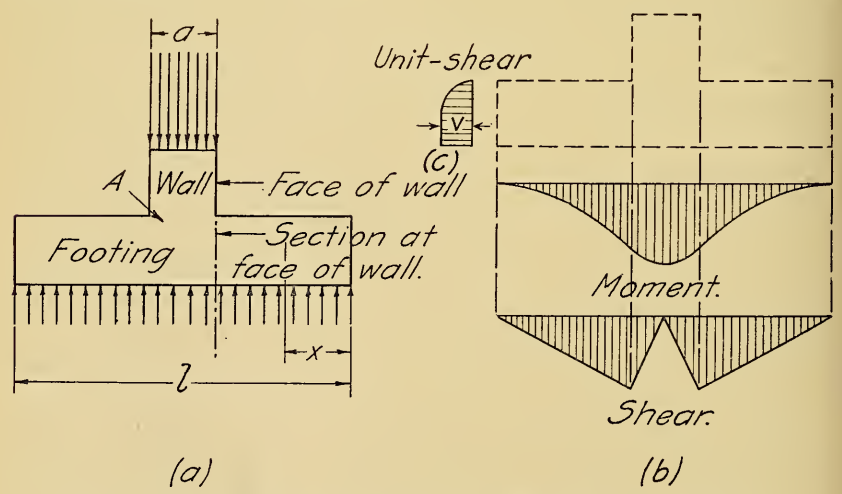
(a) DISTRIBUTION OF LOAD AND PRESSURE IN WALL FOOTING.
